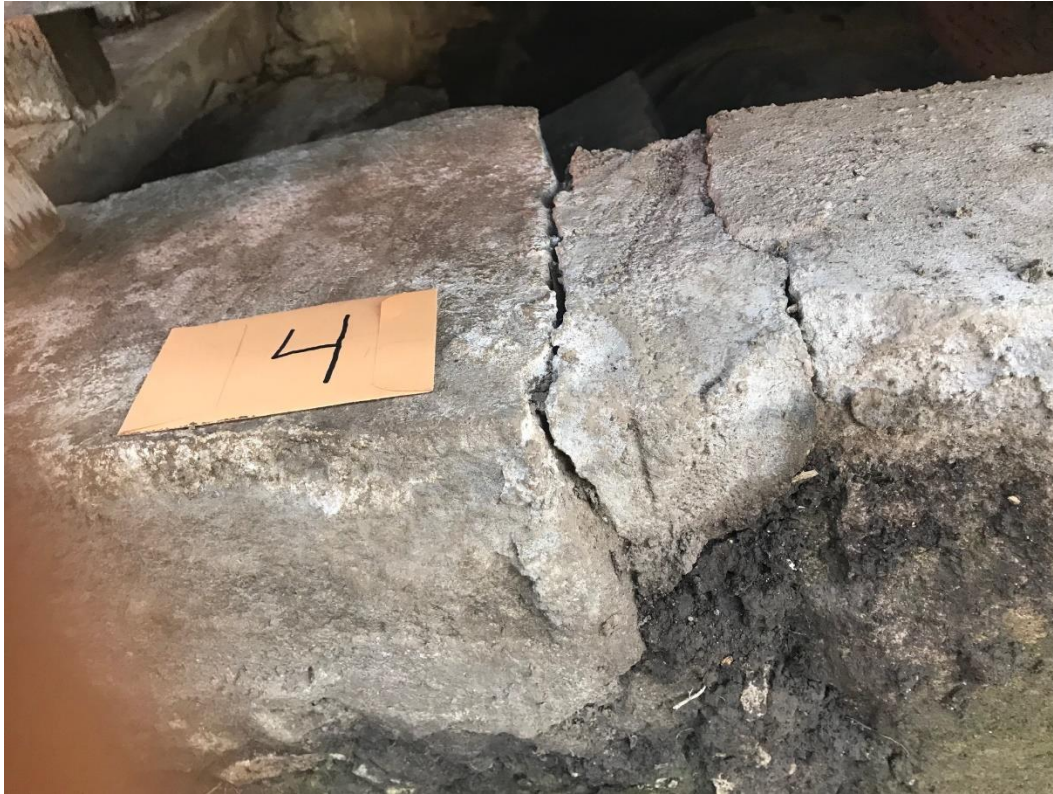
& 4: The balances of the Foundation walls have numerous movement and cracks because of poor drainage, water construction retained in the soil around the walls, and a maximum depth of 12" below the existing grade (12" shy of the minimum standard). Overall the construction is substandard. The mortar joints are stuck flush on the exterior, but have not worked joints on the back side (inside) and so have no strength through thickness (width) of the wall.
